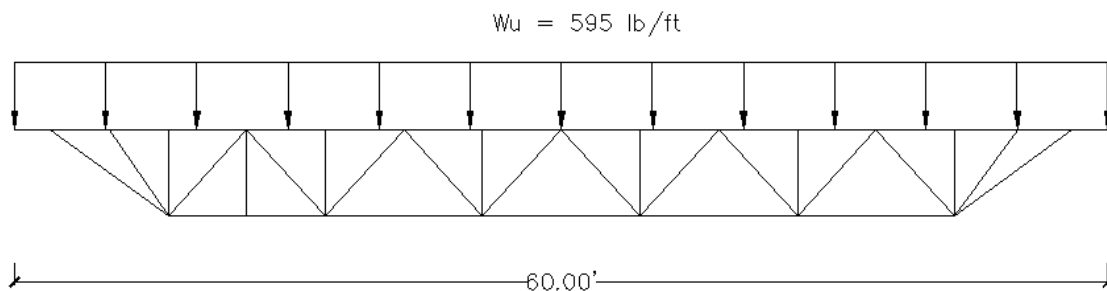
An interior steel truss joist with an applied uniform load of 595 lb/ft.
